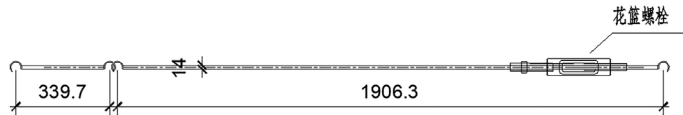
Dimension of Sway Brace (unit: mm)
